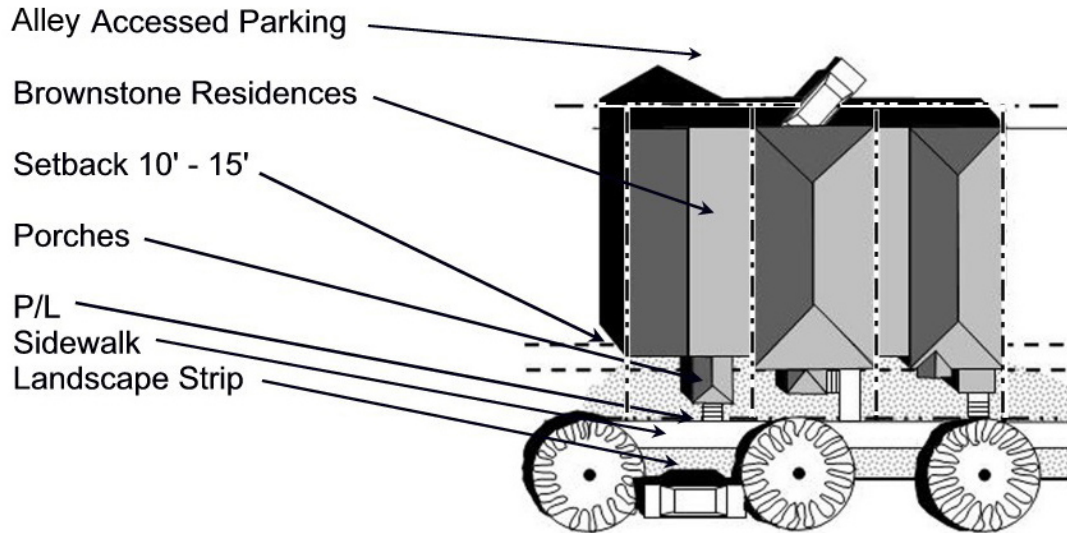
Village Center MDR (R3/DS) Townhouse-Picture and Plan View
